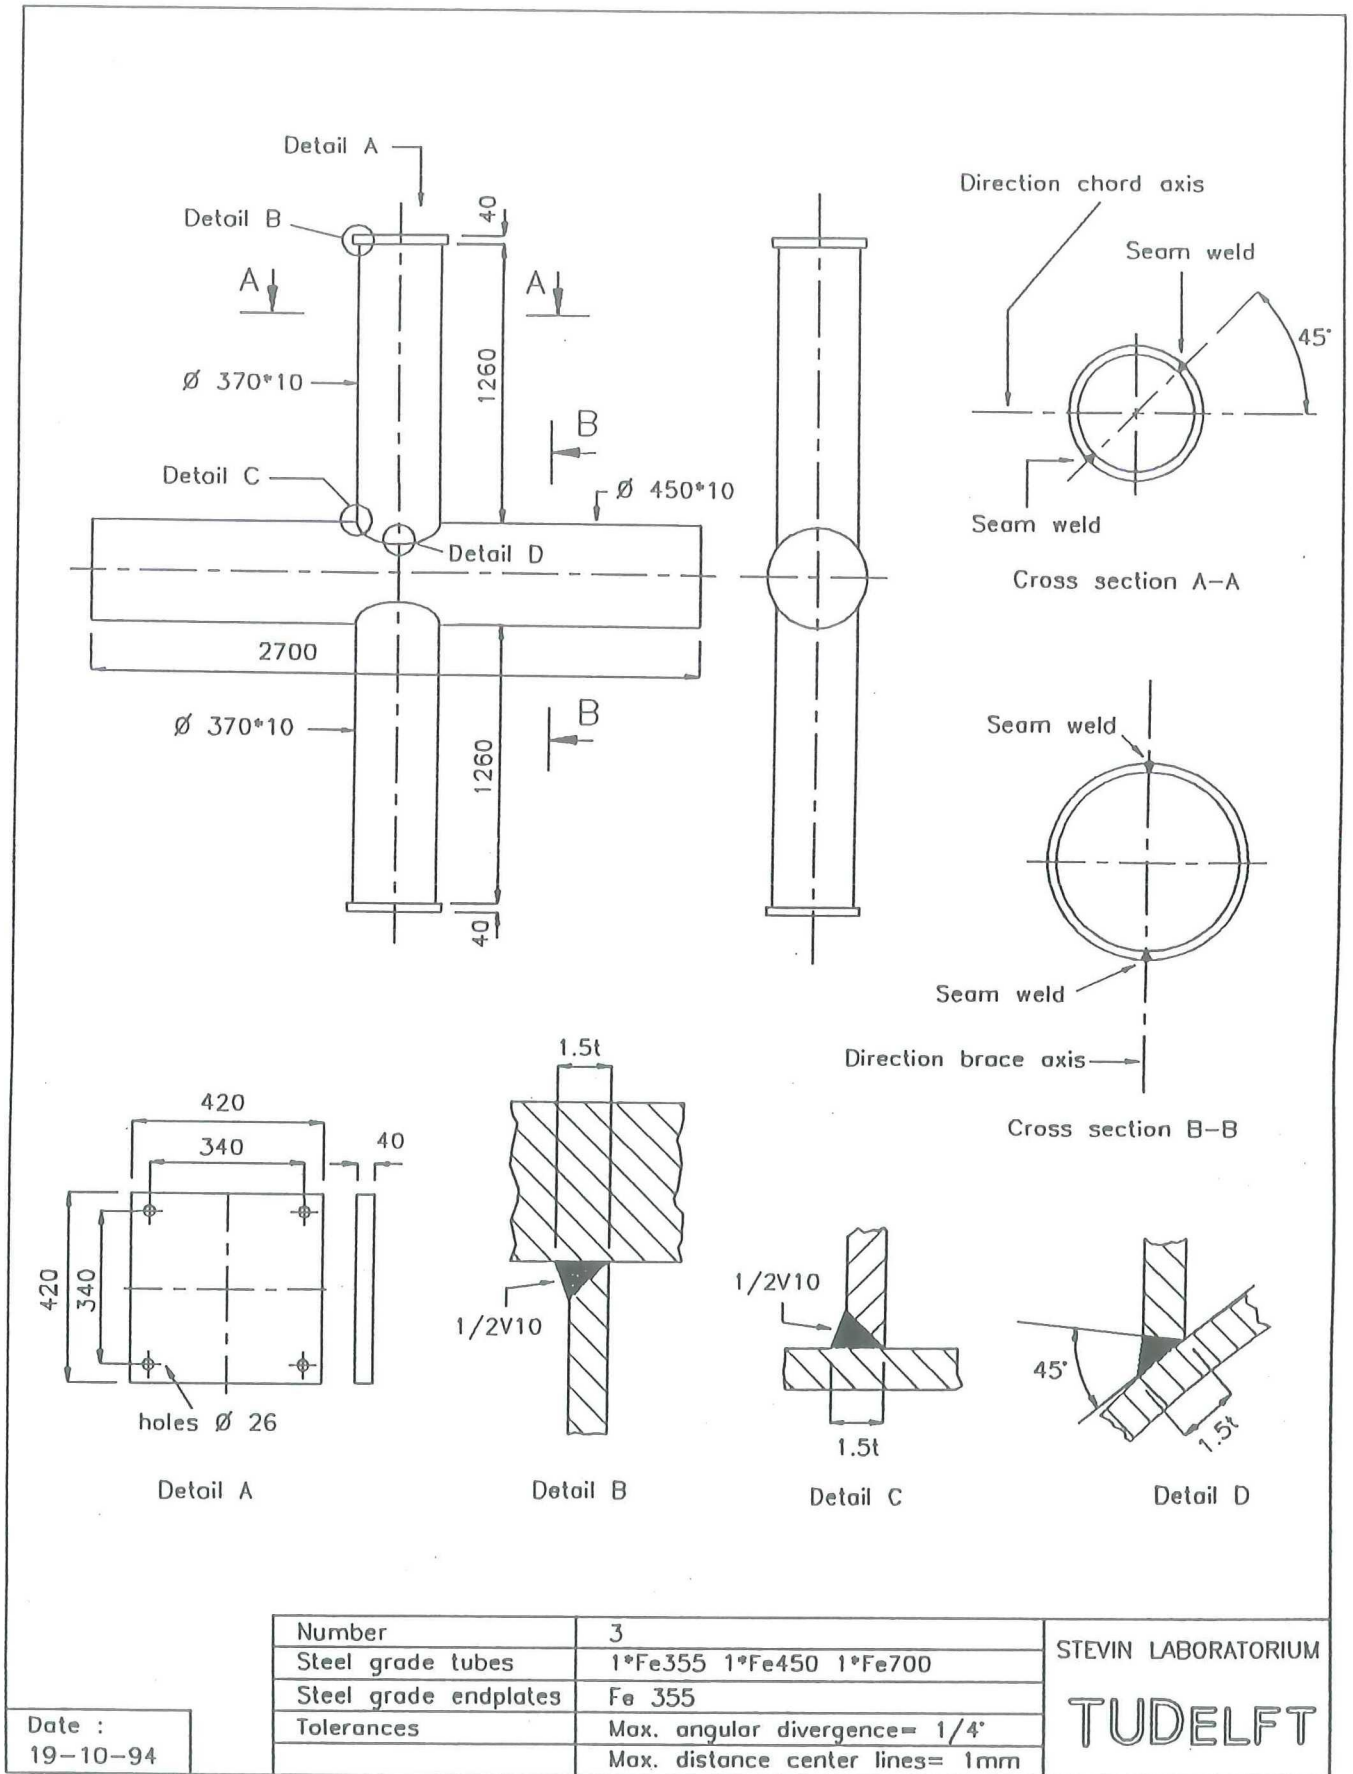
Configuration and weld details for X-joints under compression loading.
